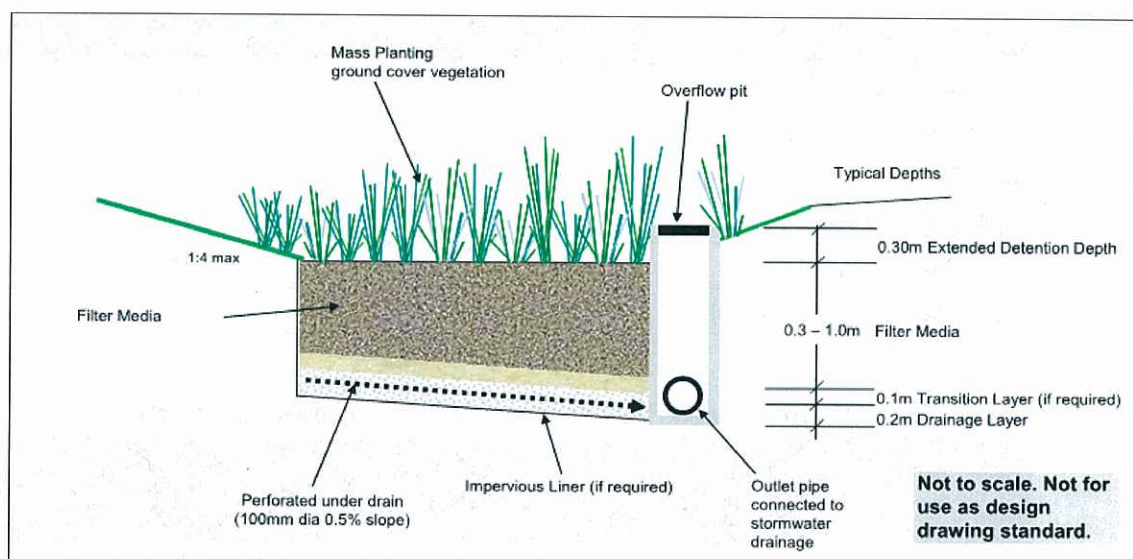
Typical Bio-retention Cross-section (FAWB 2009)
